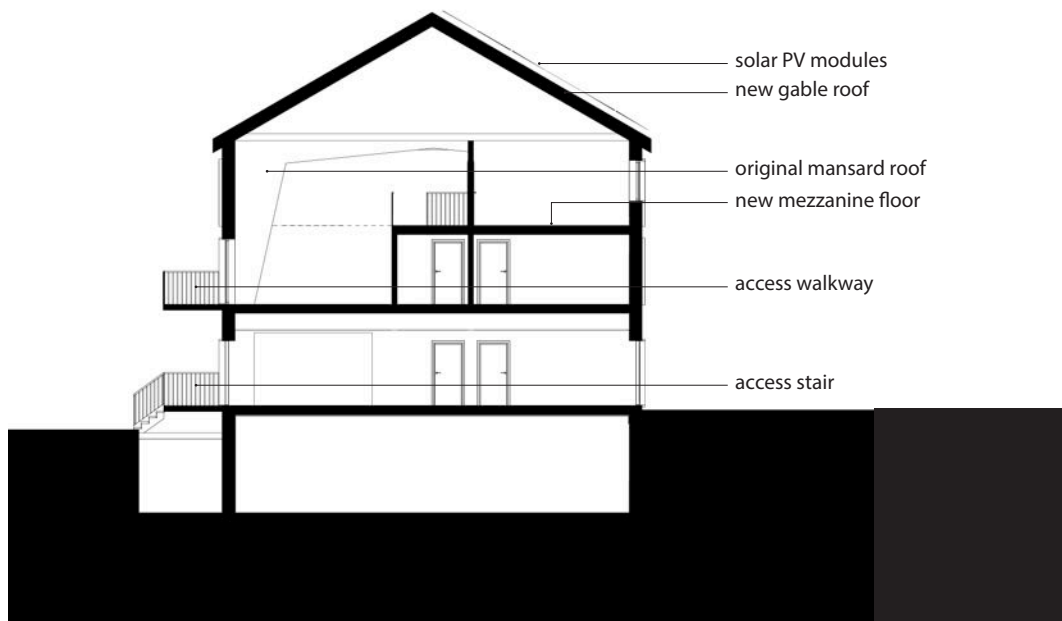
Sems Have, Block B. Section and south elevation (1:250)
